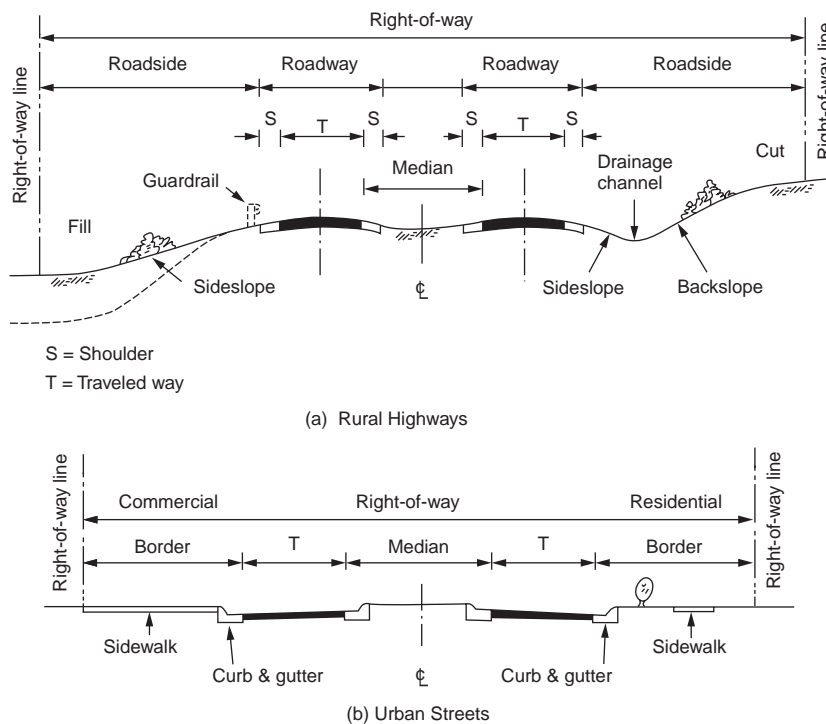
Typical cross sections for rural highways and urban streets.
